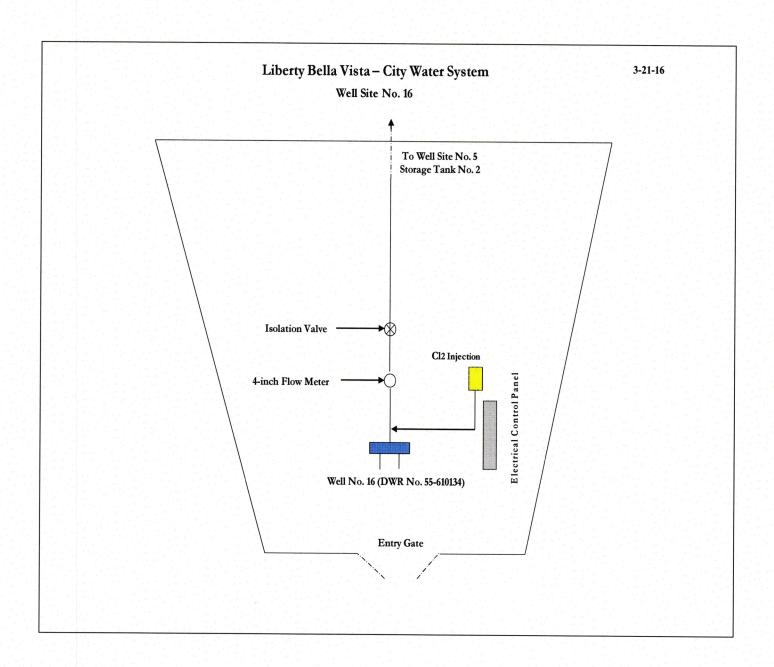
CITY WATER SYSTEM WELL SITE NO. 16
